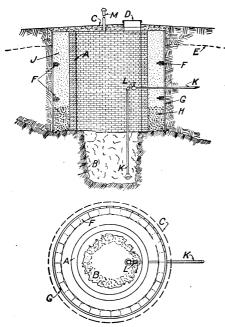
Large dug well in rock and caving earth. A, Masonry curb; B, rock excavation; C, platform; D, iron manhole frame and overhanging cover; E, original surface of ground; F, heavy wooden segmental ribs; G, heavy grooved sheet piling with hard pine splines or tongues greased before driving; H, clean gravel or stone filling; H, clean gravel or stone valve; H, screened ventilator.
